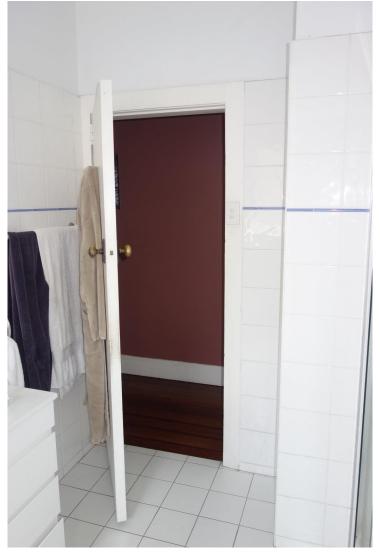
View into the renovated bathroom, accessed from the secondary hall.
